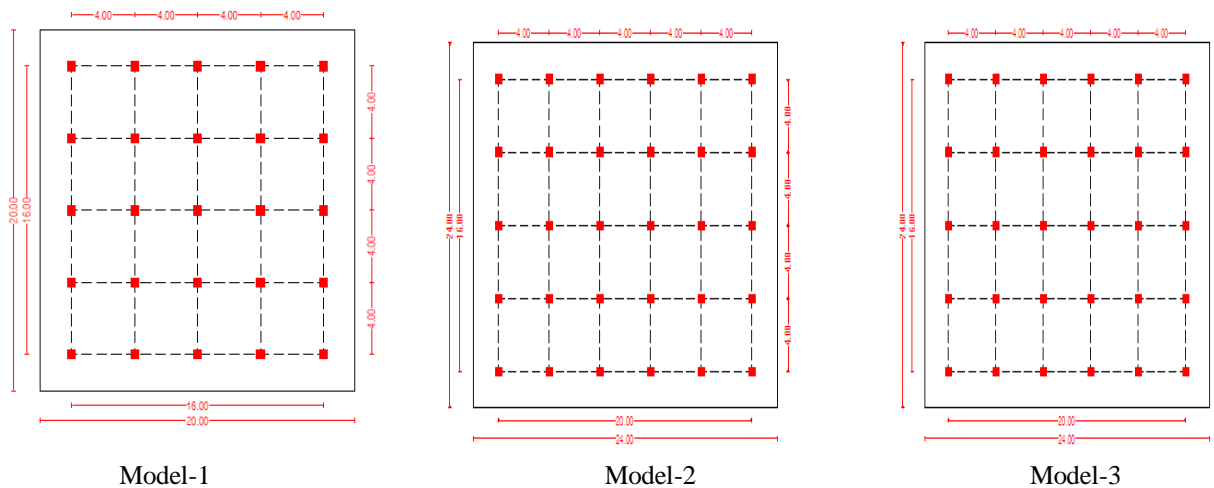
building and raft plan of 16 x 16 m, 20 x 20 m and 24 x 24 m
